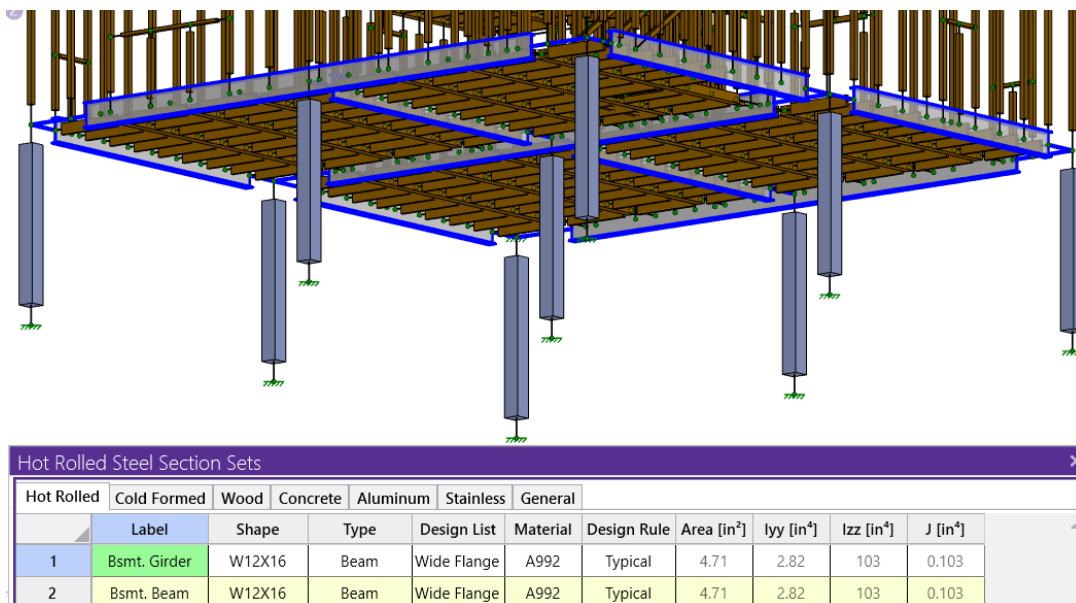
Three steel girders stretching across the bottom level of the house, with four steel beams coming off the steel girders.
